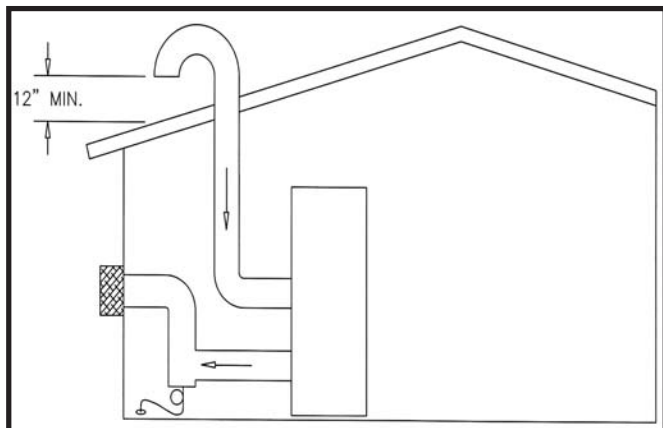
Horizontal DirectAire Installation with Rooftop Combustion Air Inlet
